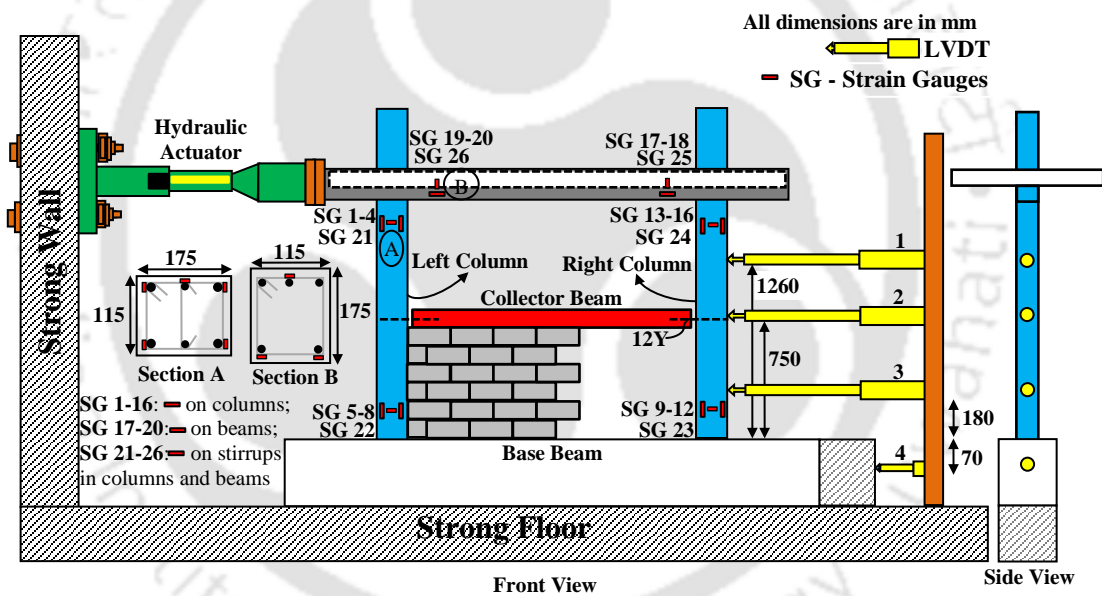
Details of test setup and instrumentation in infilled frames with collector beams.
